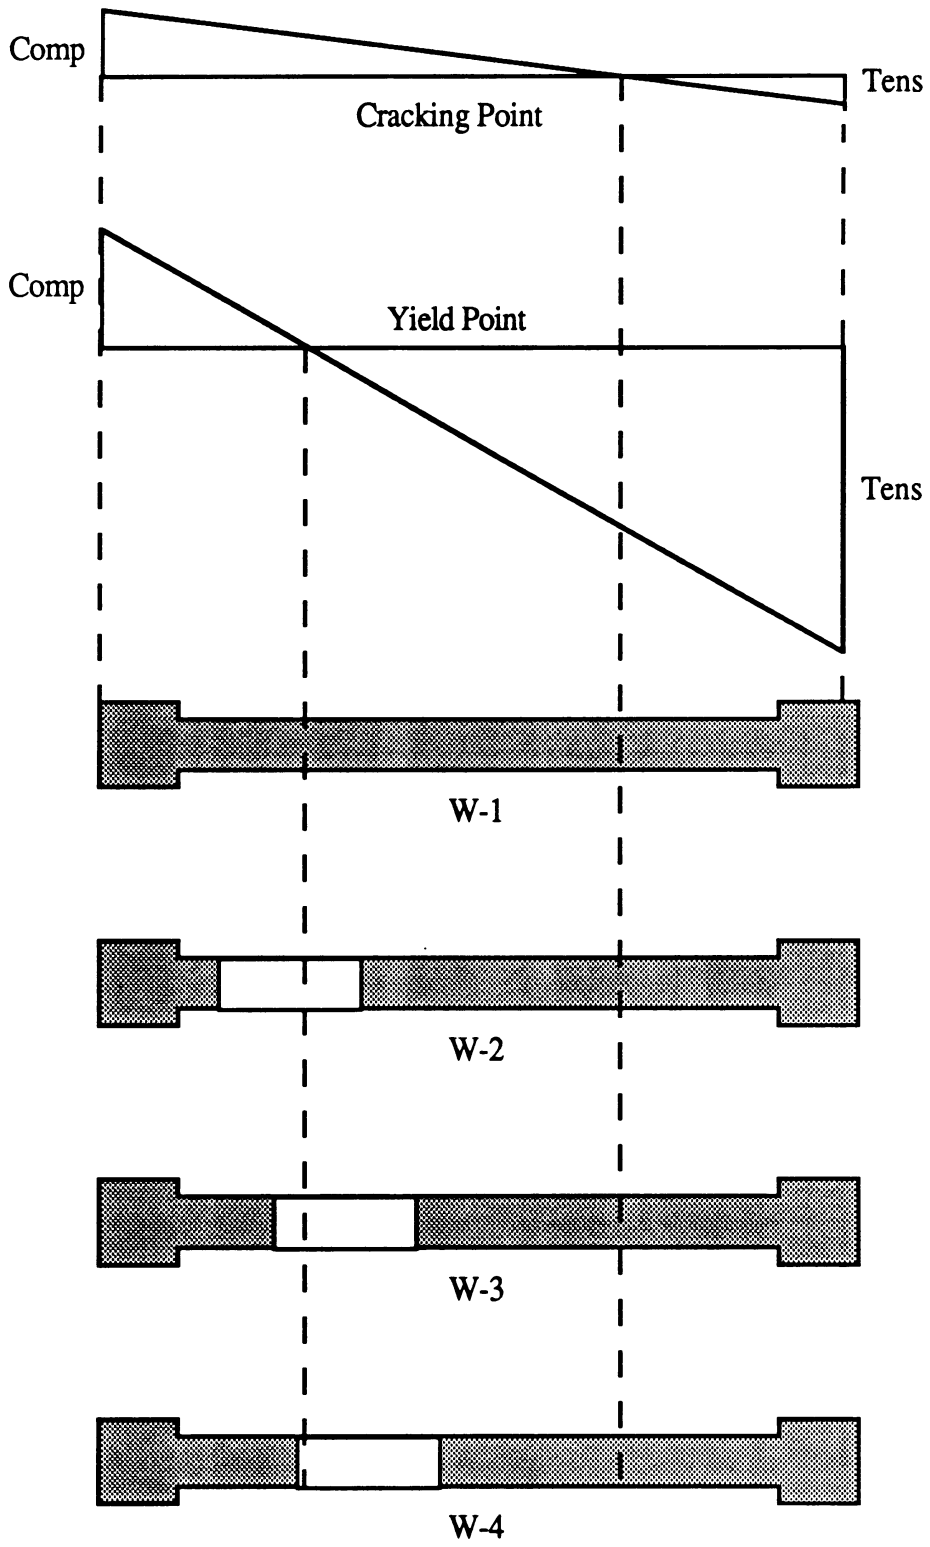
(a) : Strain Distributions at Cracking and Yield Points for Wall W-1 through W-4 for Loading in East Direction.
